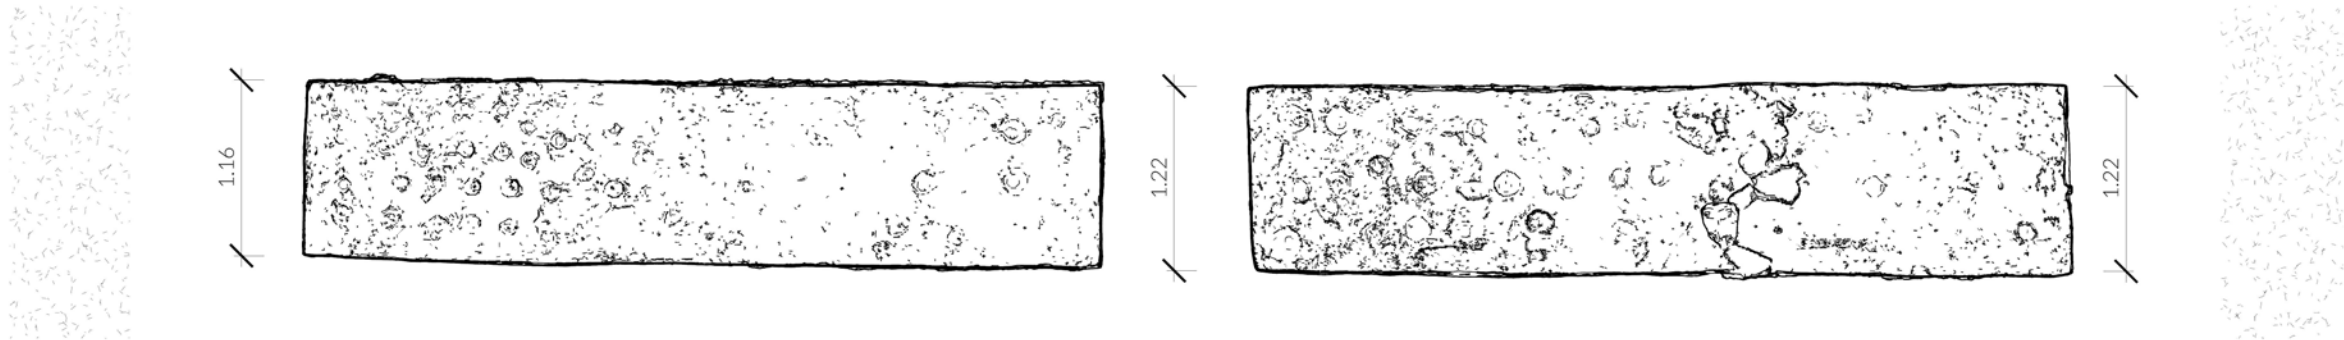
Floor plan YKK6 - YKK5, 1:50
